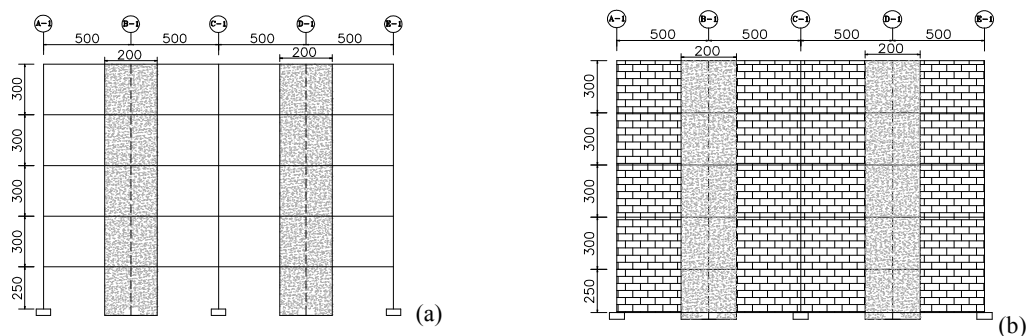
Location of shear wall in RC frame without URM infills (a) with URM infills(b)
